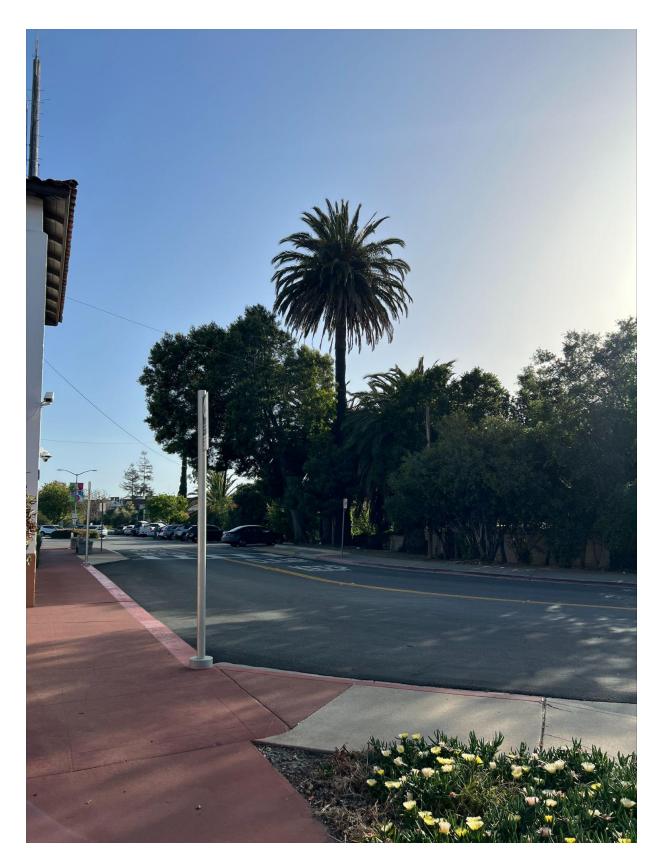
Bottom of Site, looking Northeast (1)
